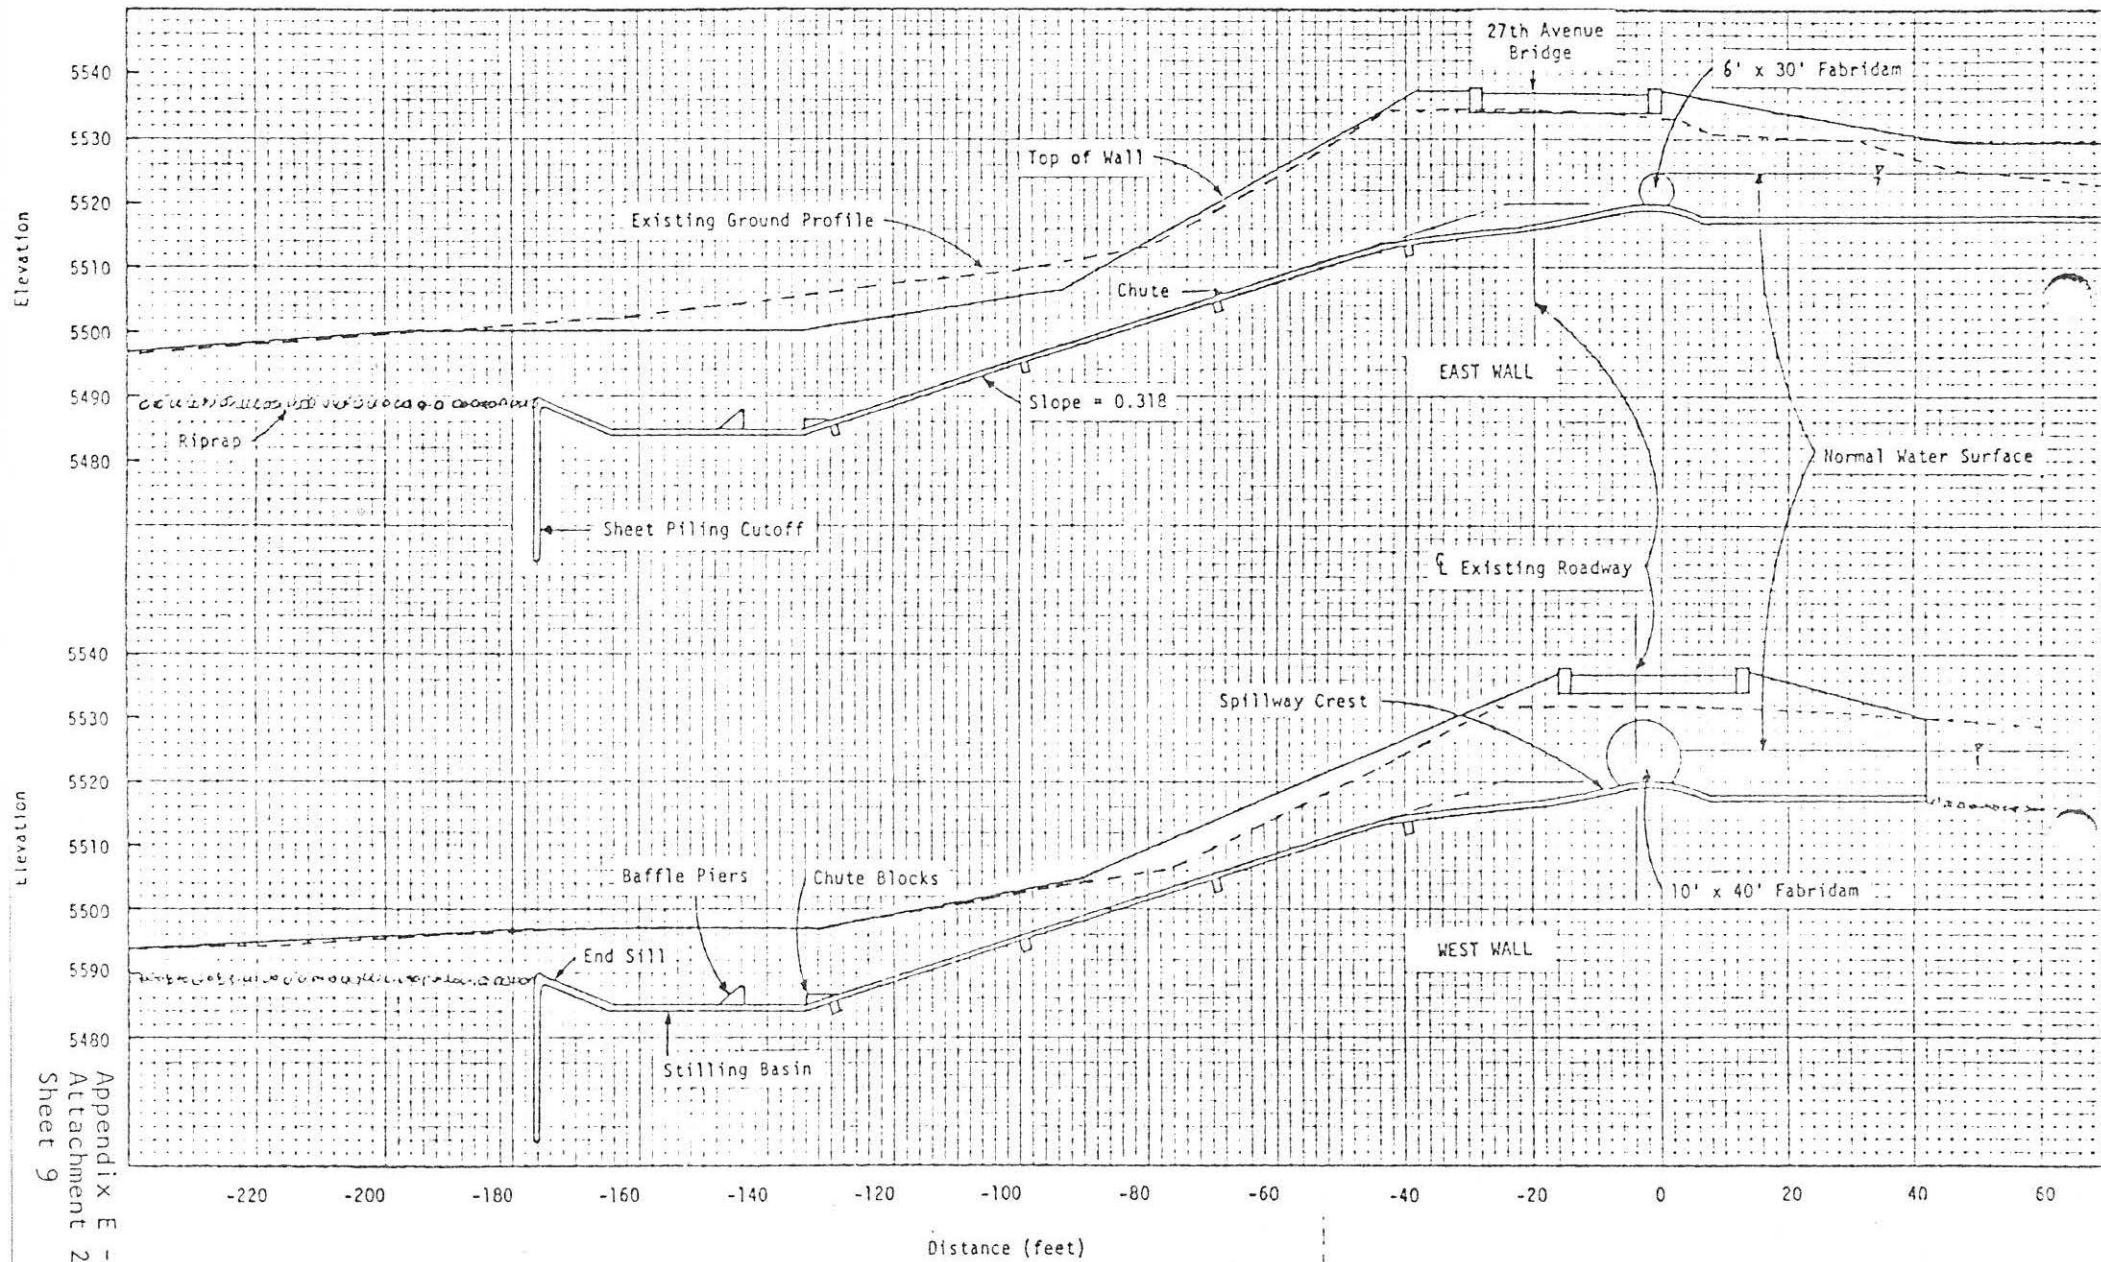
Longitudinal Profiles of Spillway at East and West Walls for Maple Grove Dam and Reservoir.
